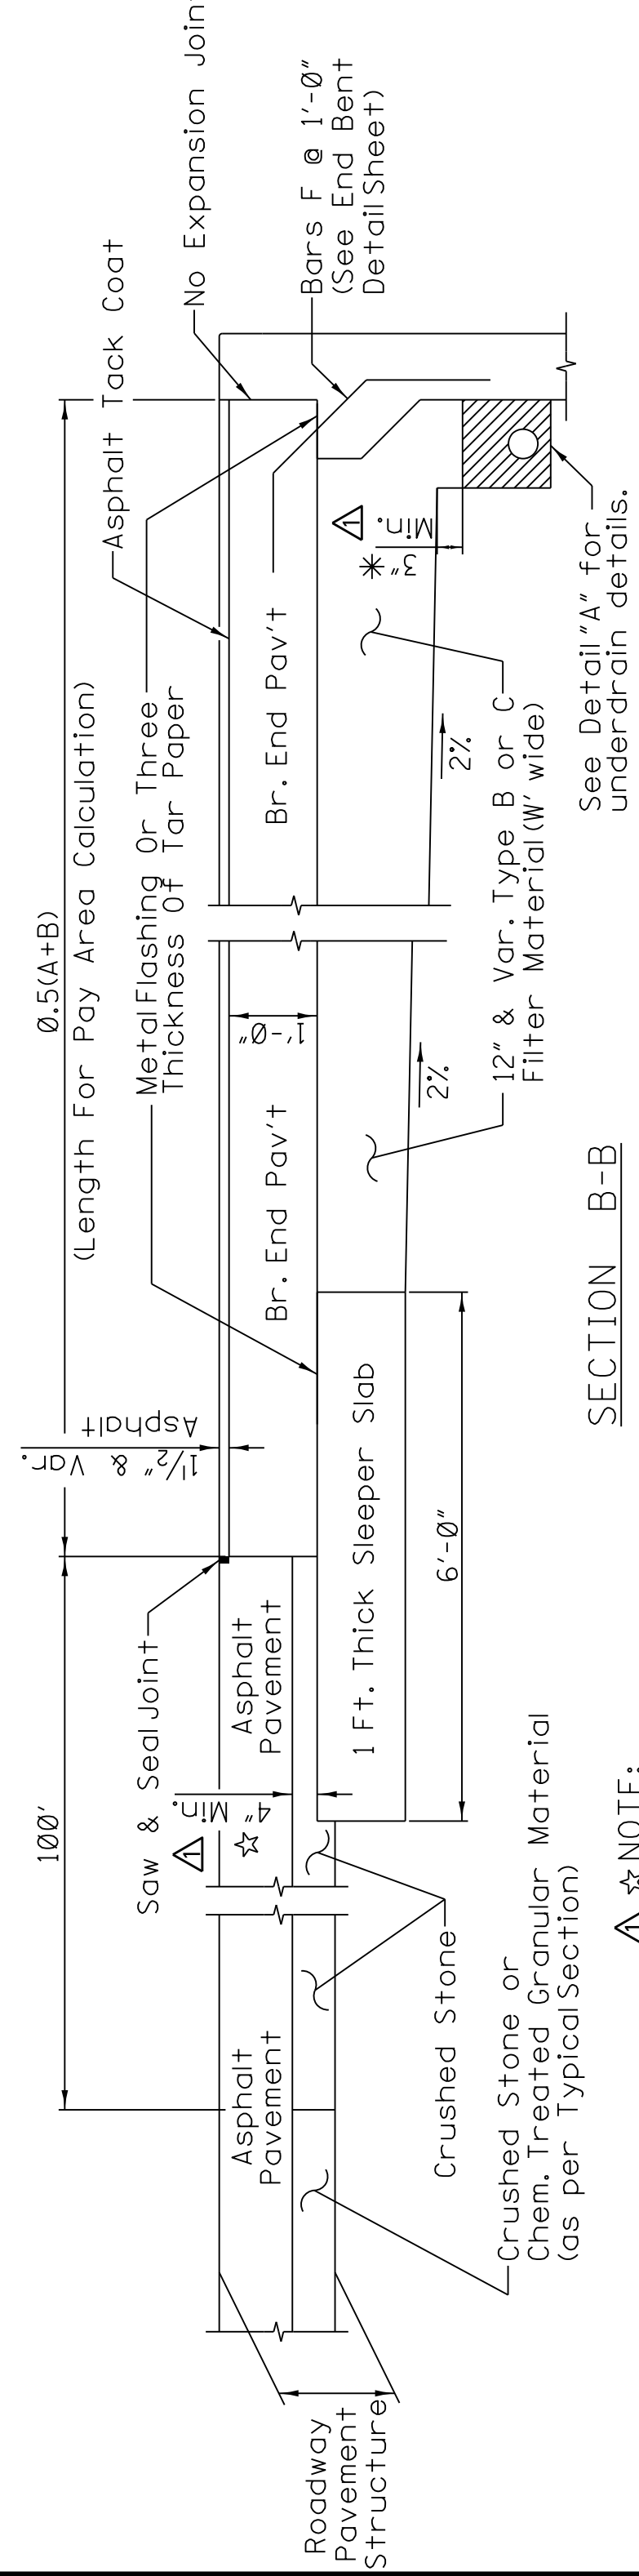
DETAIL SHOWING METHOD OF SEATING BRIDGE END PAVEMENT ON BRIDGES WITH NO PAVING BRACKET
